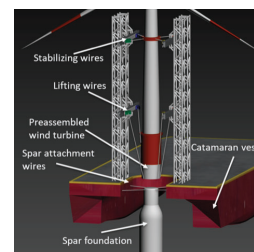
Catamaran vessel installing an OWT tower onto a floating SPAR-type foundation
